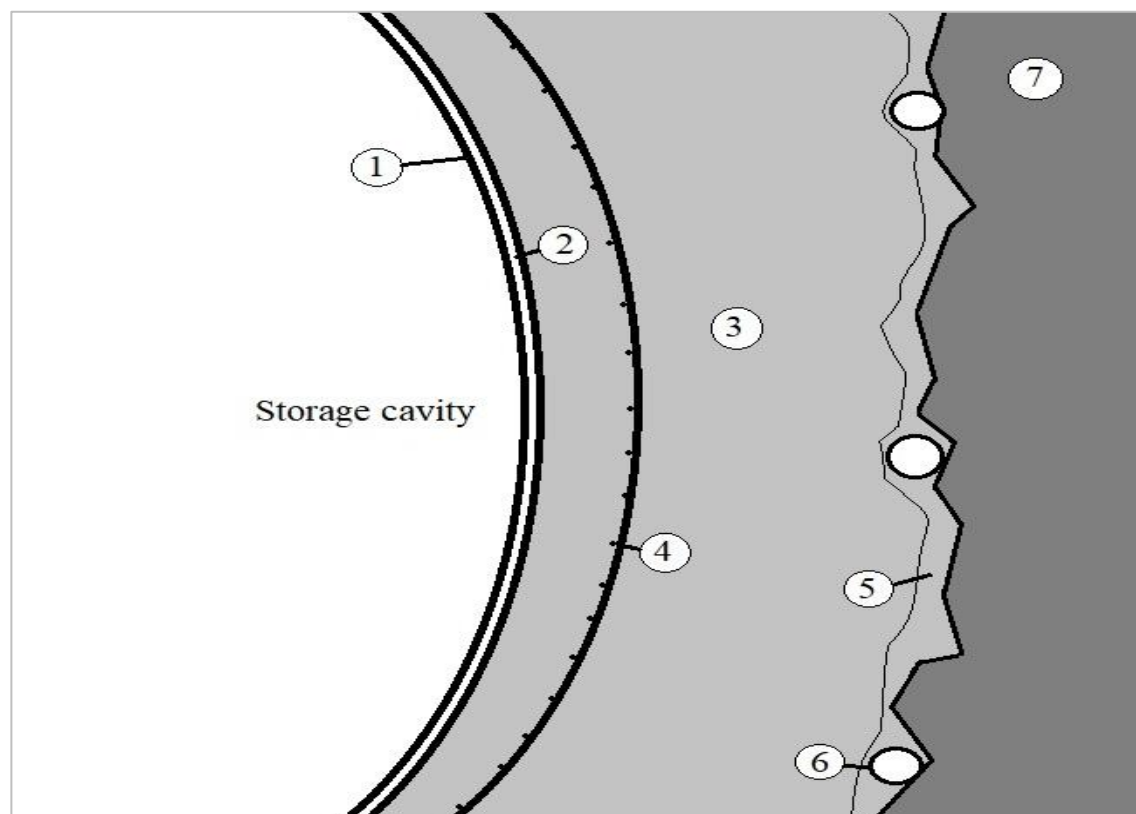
The structure of a LRC consists of steel lining (1), sliding layer (2), concrete (3), welded mesh structure (4), shotcrete (5), drainage system (6), and the surrounding rock mass (7) (adapted from Johansson 2003).
